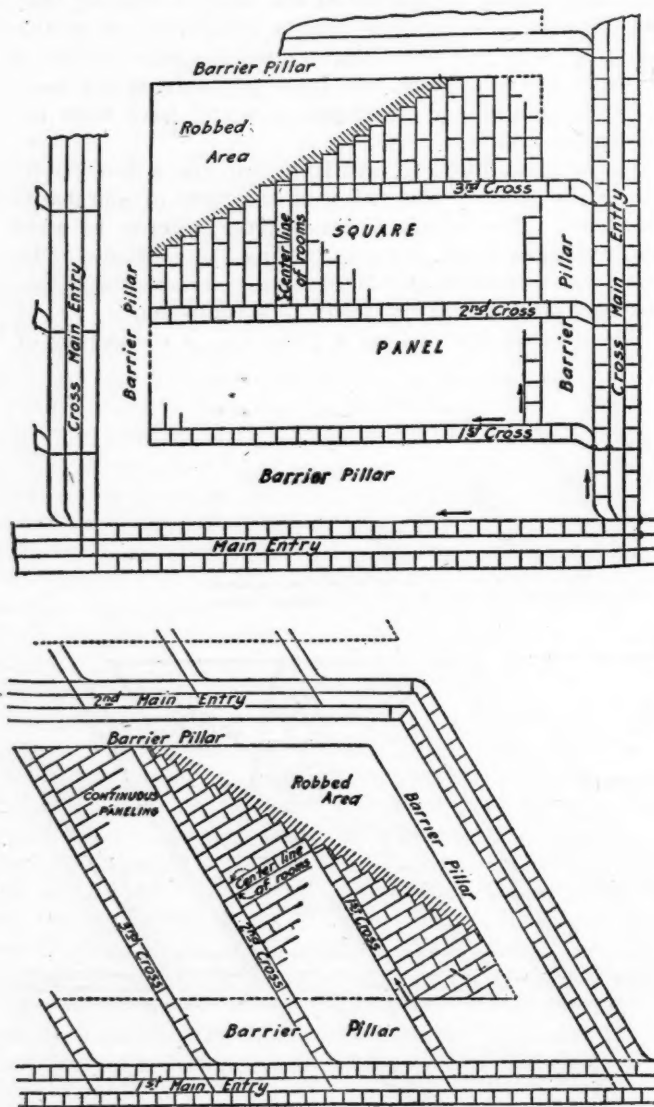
TWO TYPICAL PLANS FOR WORKING A PANEL
